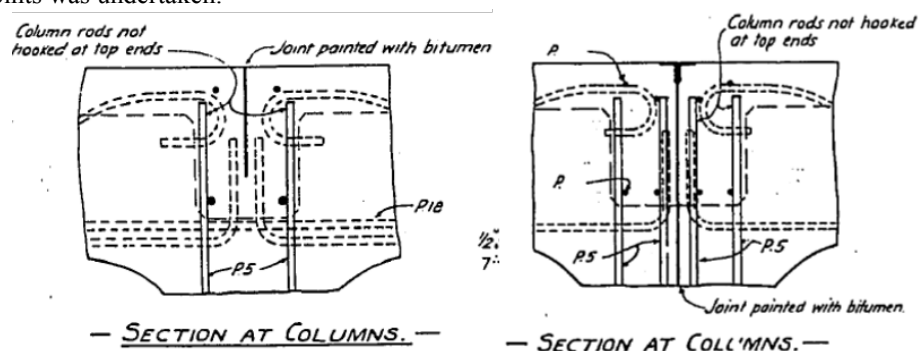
Typical beam reinforcement at pier and split pier joints of Rakaia and Rangitata River Bridges.
